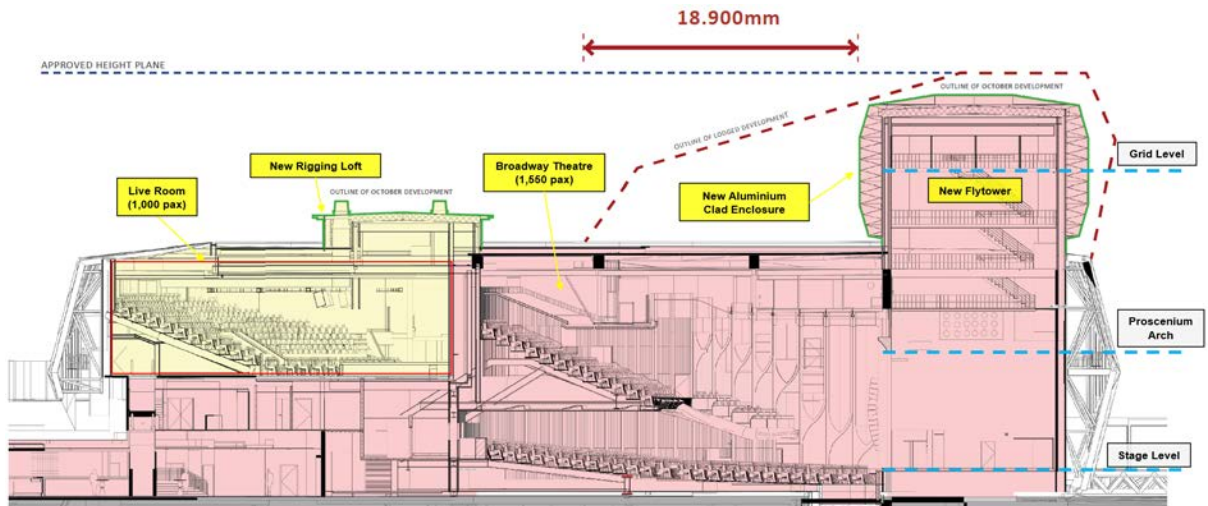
| Section of originally lodged (red dashed outline) and amended proposal (Source: RtS)
